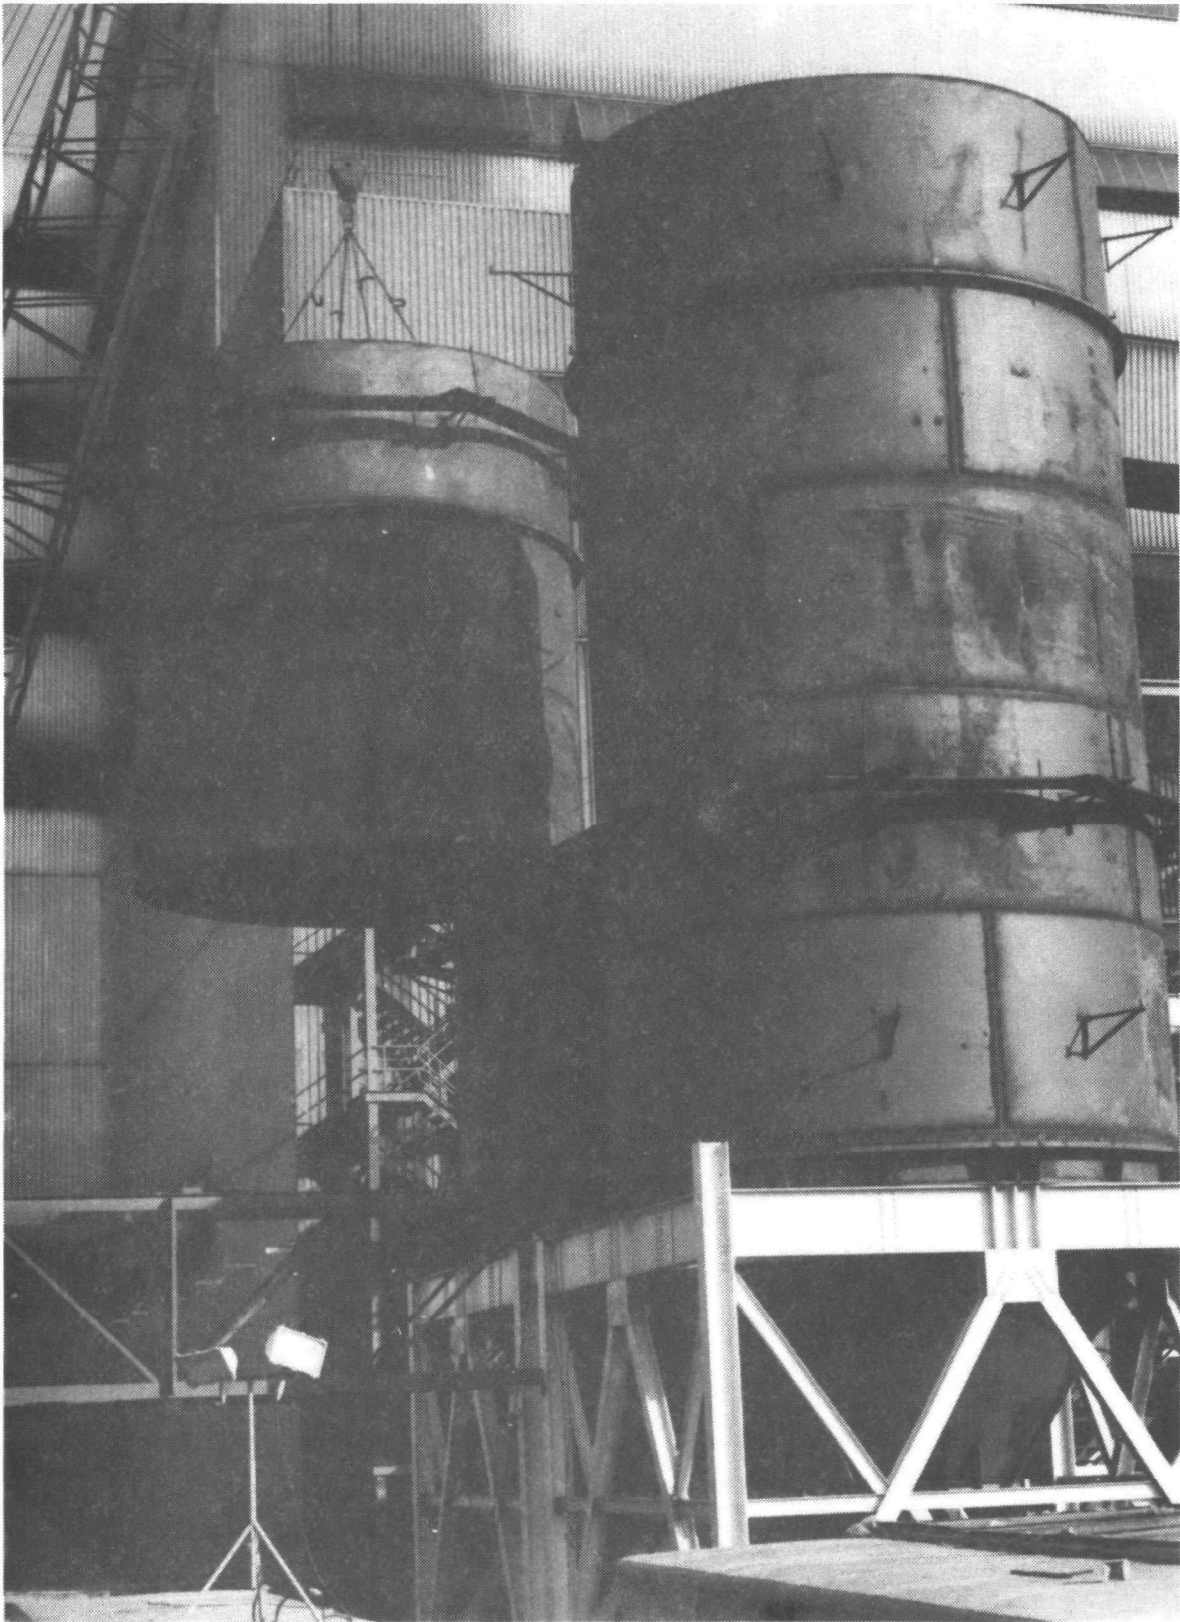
Construction photo showing installation of MgO silo at Eddystone. Boiler house appears in background.
